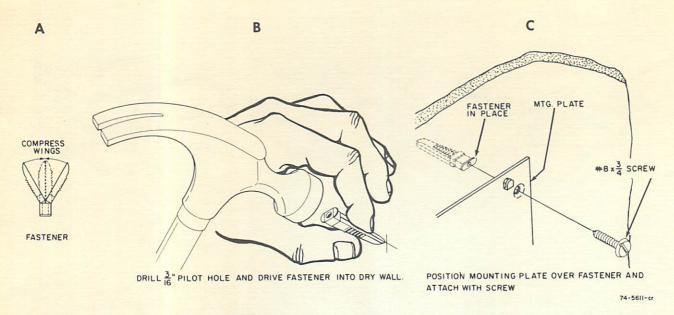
Using Hilti Fastener and Screw to Mount Device.
